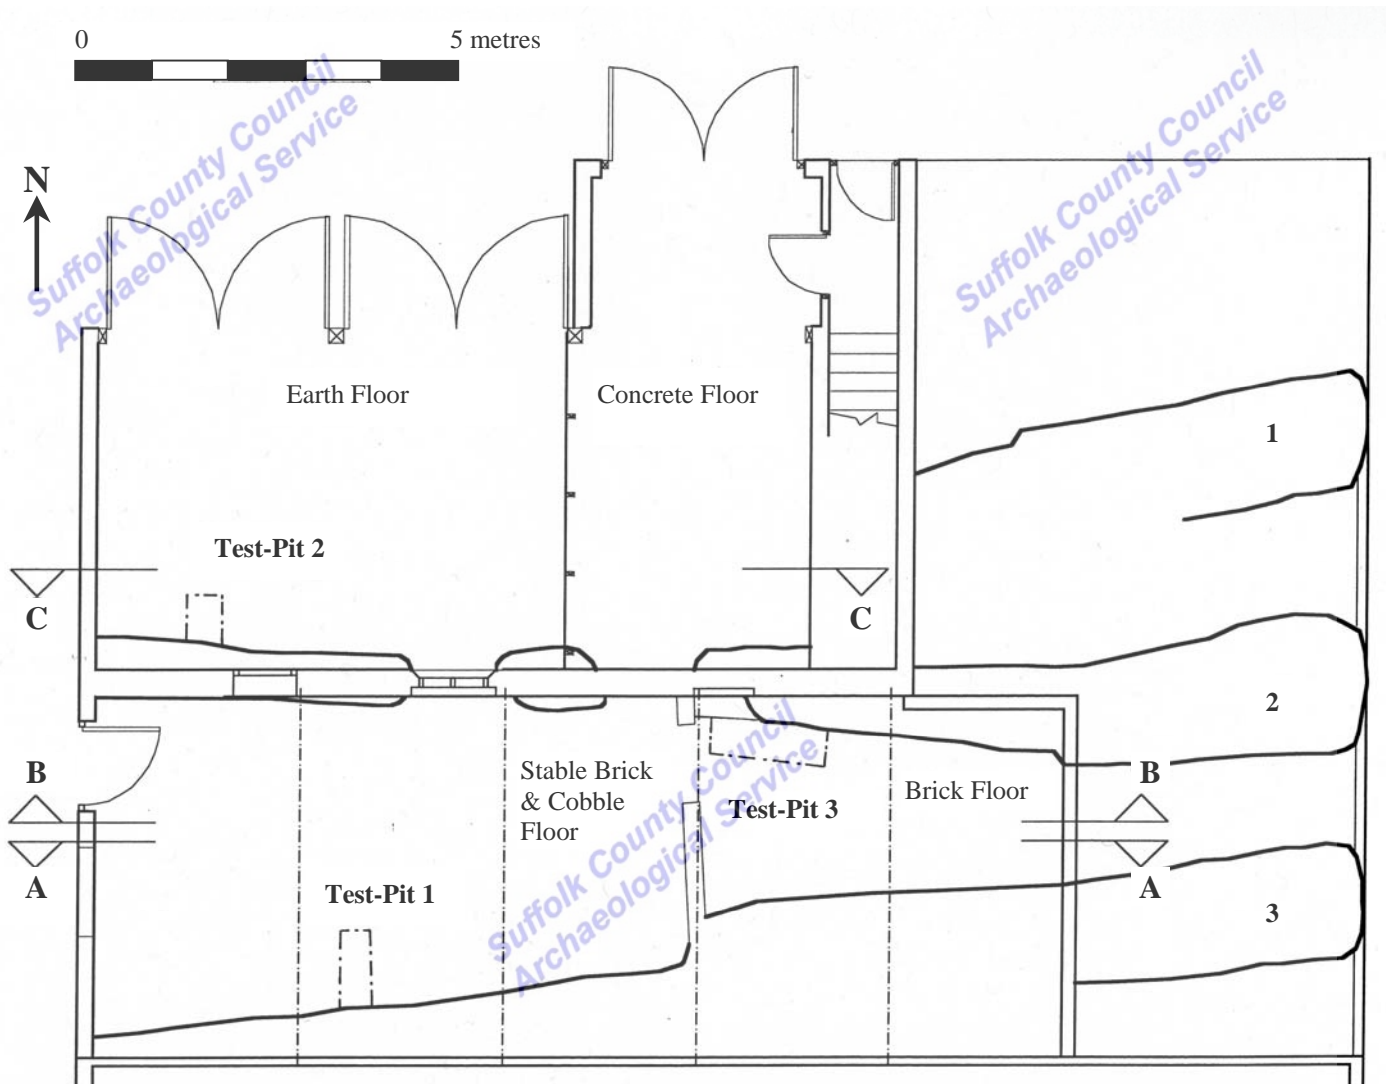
1:100 Scale Plan of the Extant Building & Location of Test-Pits
